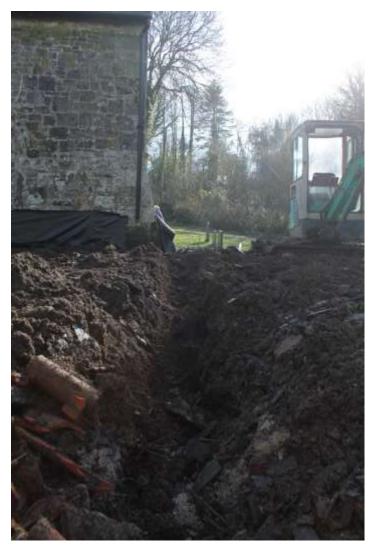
View south-southeast along run off drain leading to northwestern corner of nave
